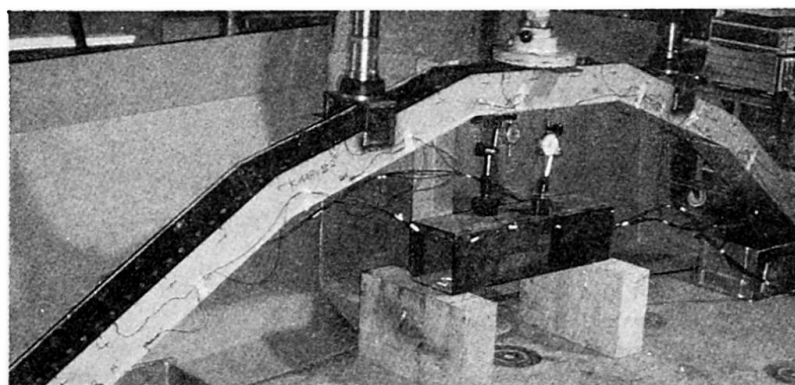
Loading arrangement and the cross-section of the tested arches.
